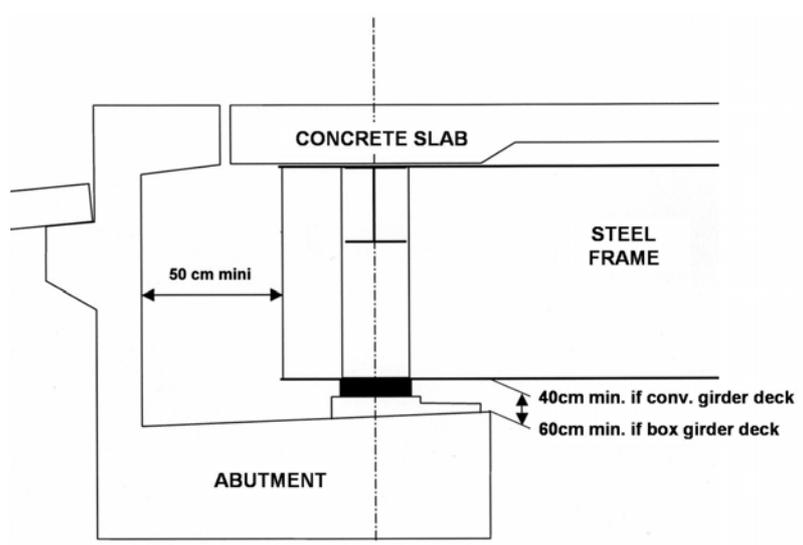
Minimum spaces on abutments under or behind the steelwork
